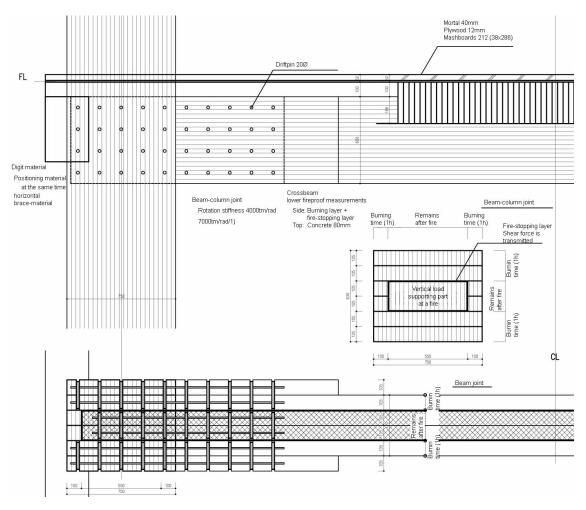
c - Detail: Construction; Dimensions in [mm]
